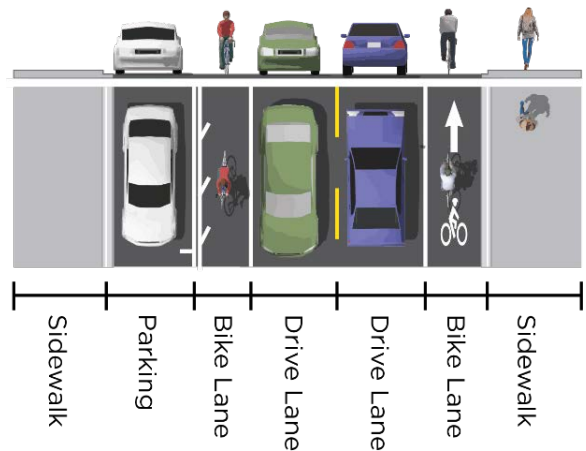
Potential Broadway Avenue Cross Section - 11th St to San Pablo Ave
